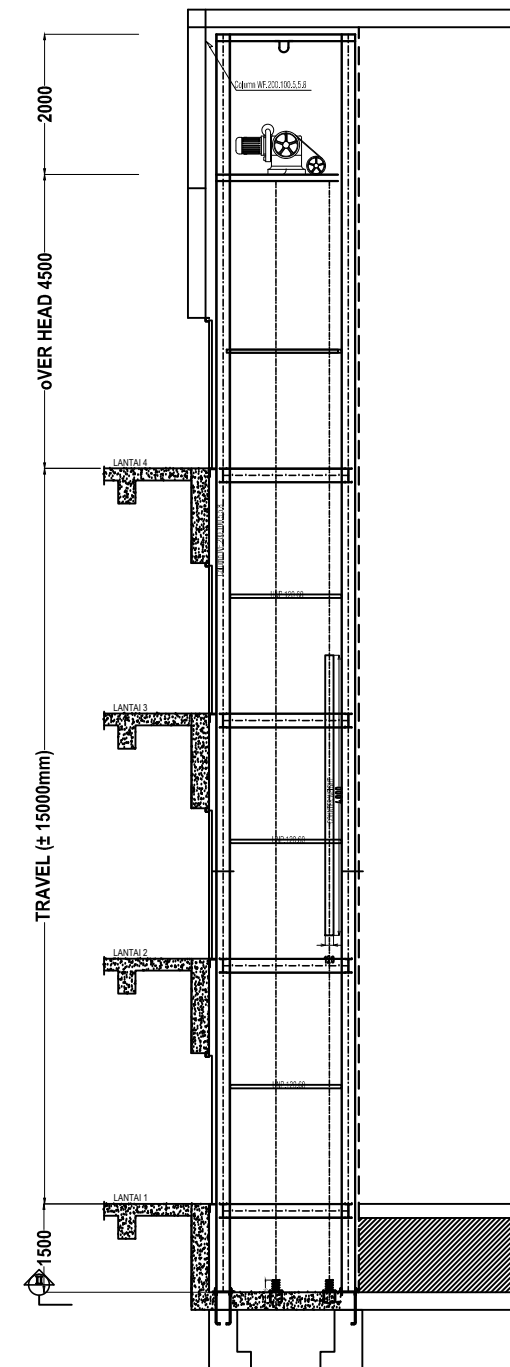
DETAILED SHAFT HOISTWAY & CONSTRUCTION PLANN
